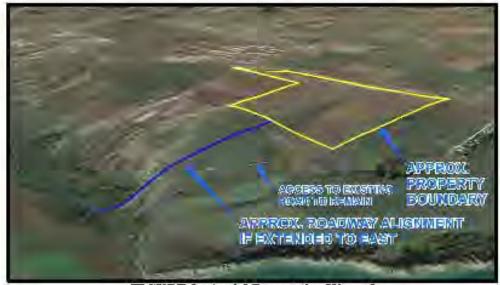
Aerial Perspective View of Development and Topography Looking Southwest
